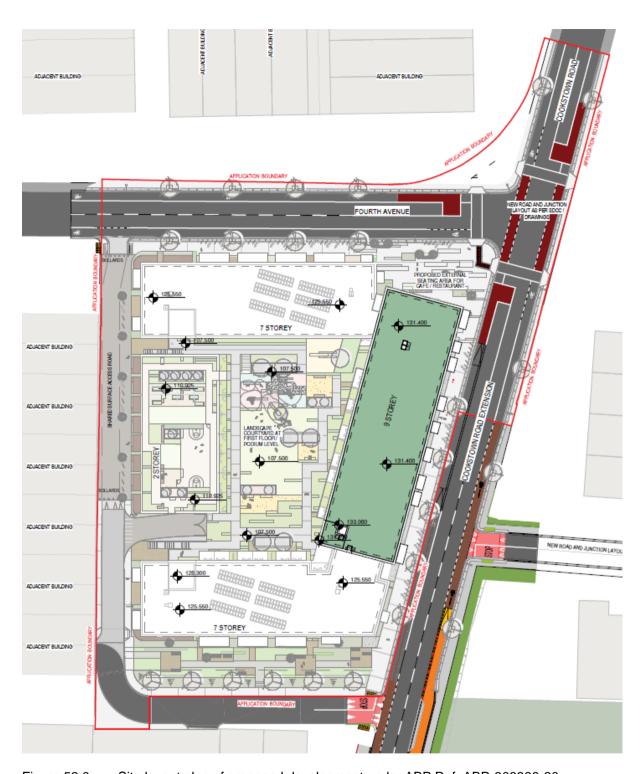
Site layout plan of proposed development under ABP Ref. ABP-308398-20
